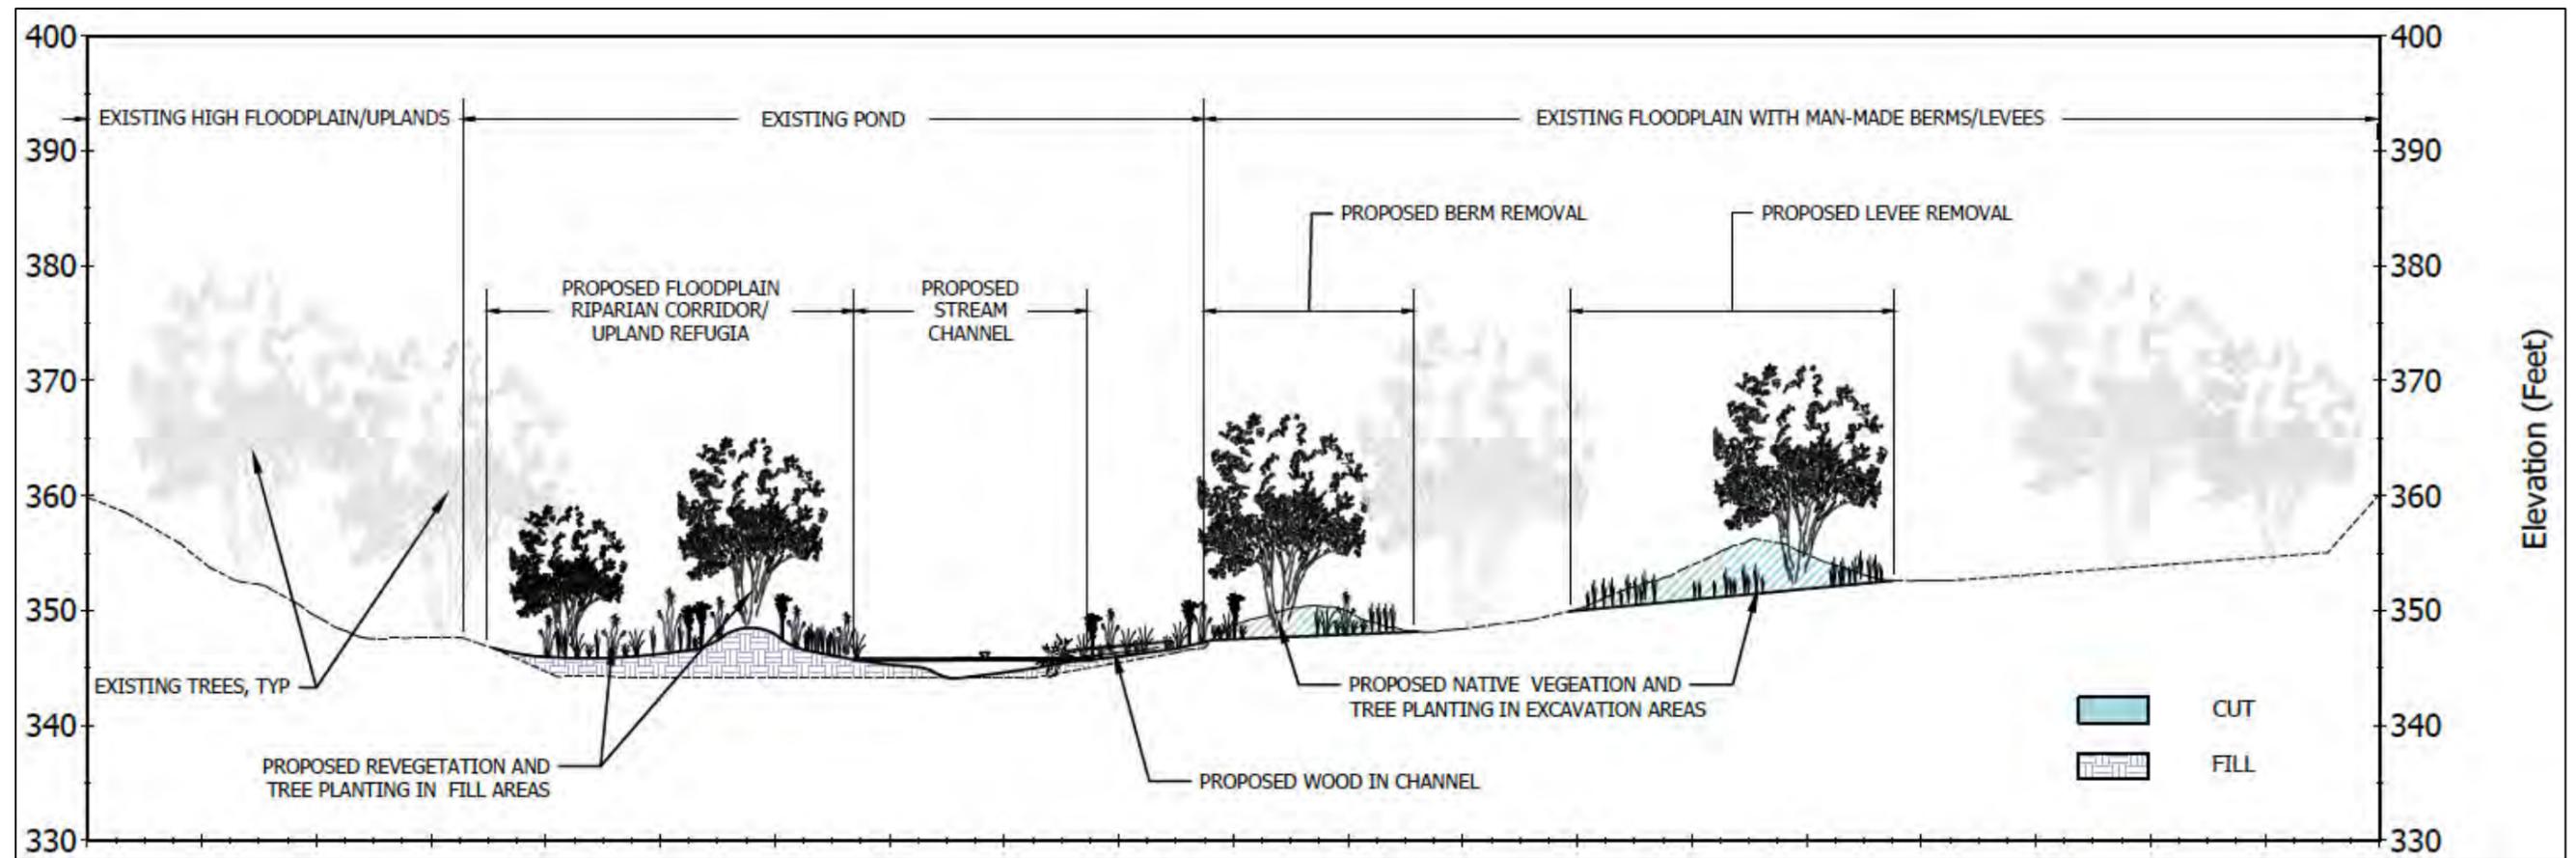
Detail of conceptual Pond Conversion to Stream Habitat - Section View.
